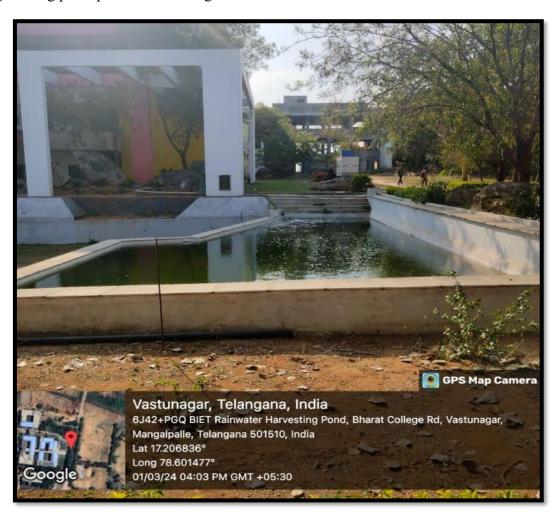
Rooftop rainwater harvesting - storage trench in BIET:
